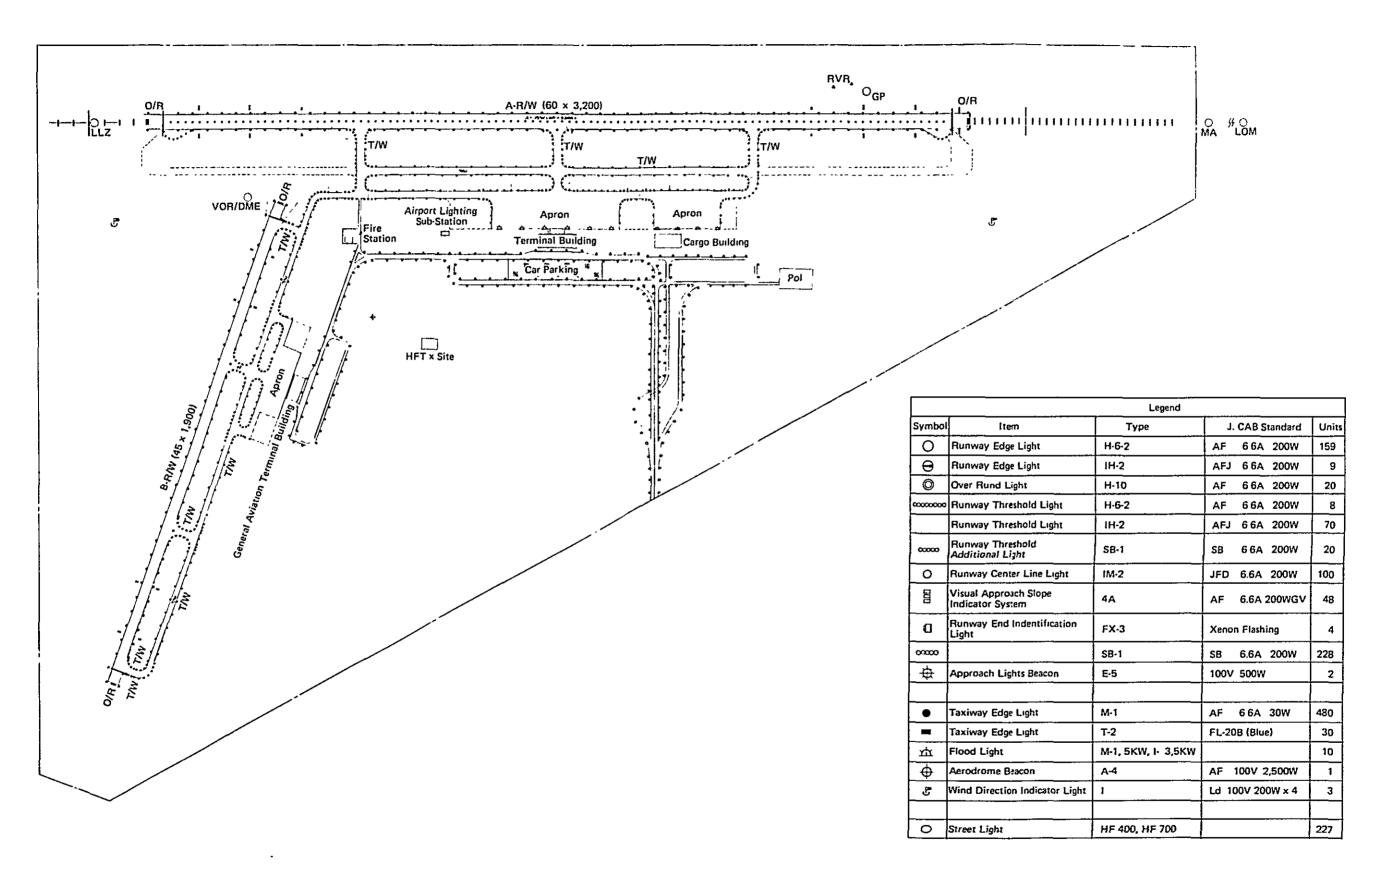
Proposed Airport Navigational Aid Facility Plan Scale 1/5,000
